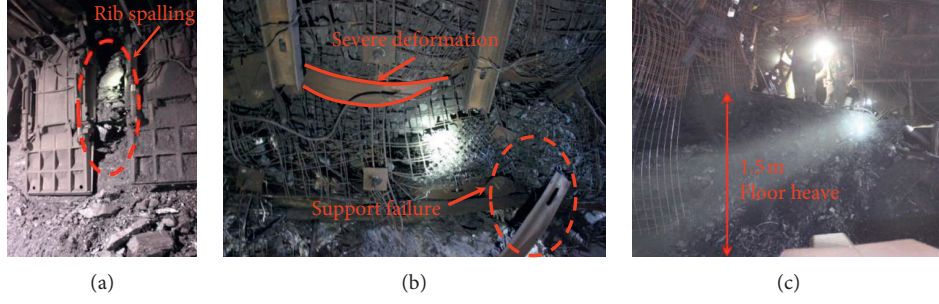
Damage to surrounding rock caused by high ground stress. (a) Rib spalling. (b) Roadway severe deformation. (c) Floor heave.
